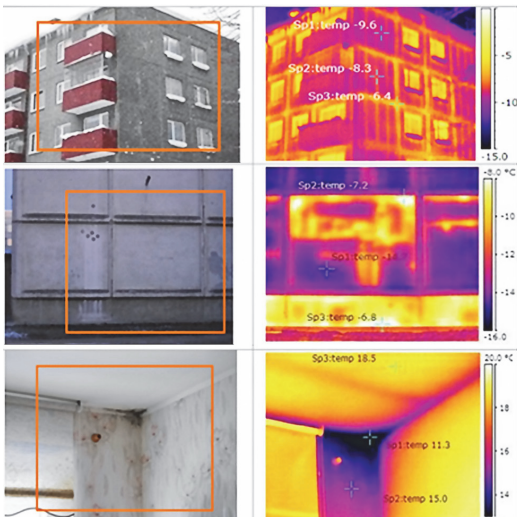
Thermal bridges of a concrete element apartment building from outside (top and middle) and from inside (bottom)
